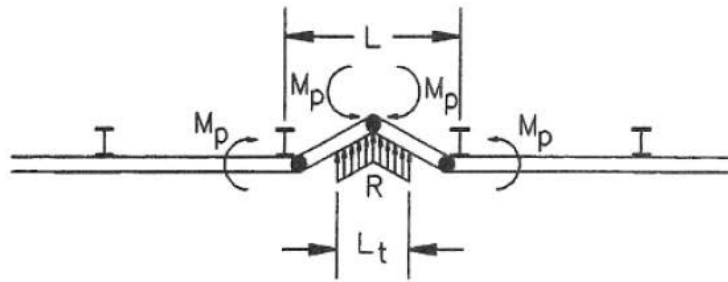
Single-Span Failure Mode for Post-and-Beam Railings
